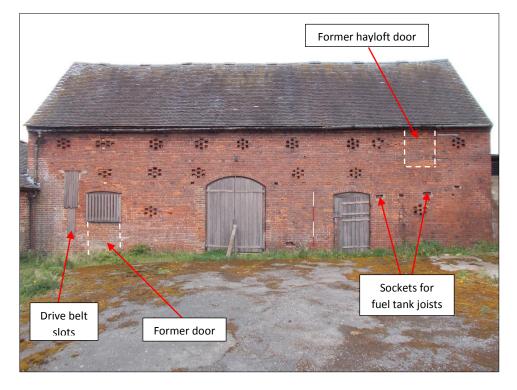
The barn, looking north-east. Former hayloft or pitching door at first-floor level and former groundfloor door outlined in white dashed lines. 2m scale rod.
